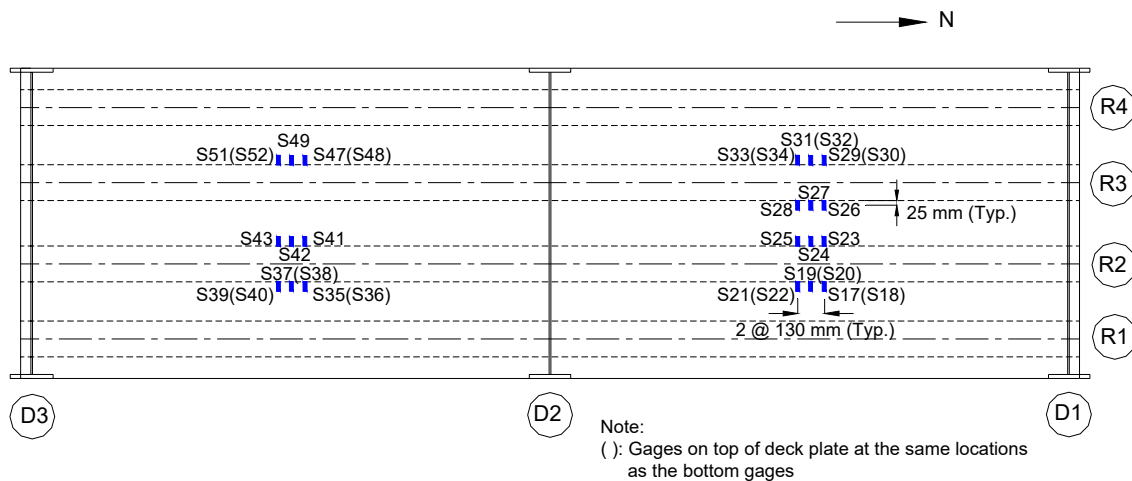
Specimen 5: Uni-axial Strain Gages in Deck Plate Near Rib-to-Deck Welds
